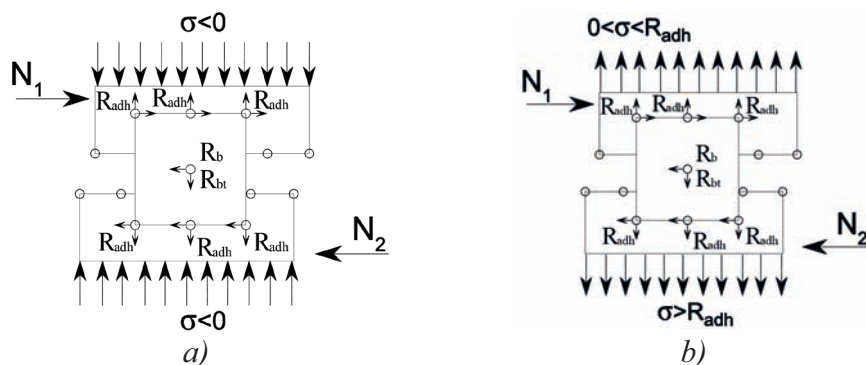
Model of interaction between damaged masonry and shotcrete elements in compression and shear (a), tension and shear (b)
